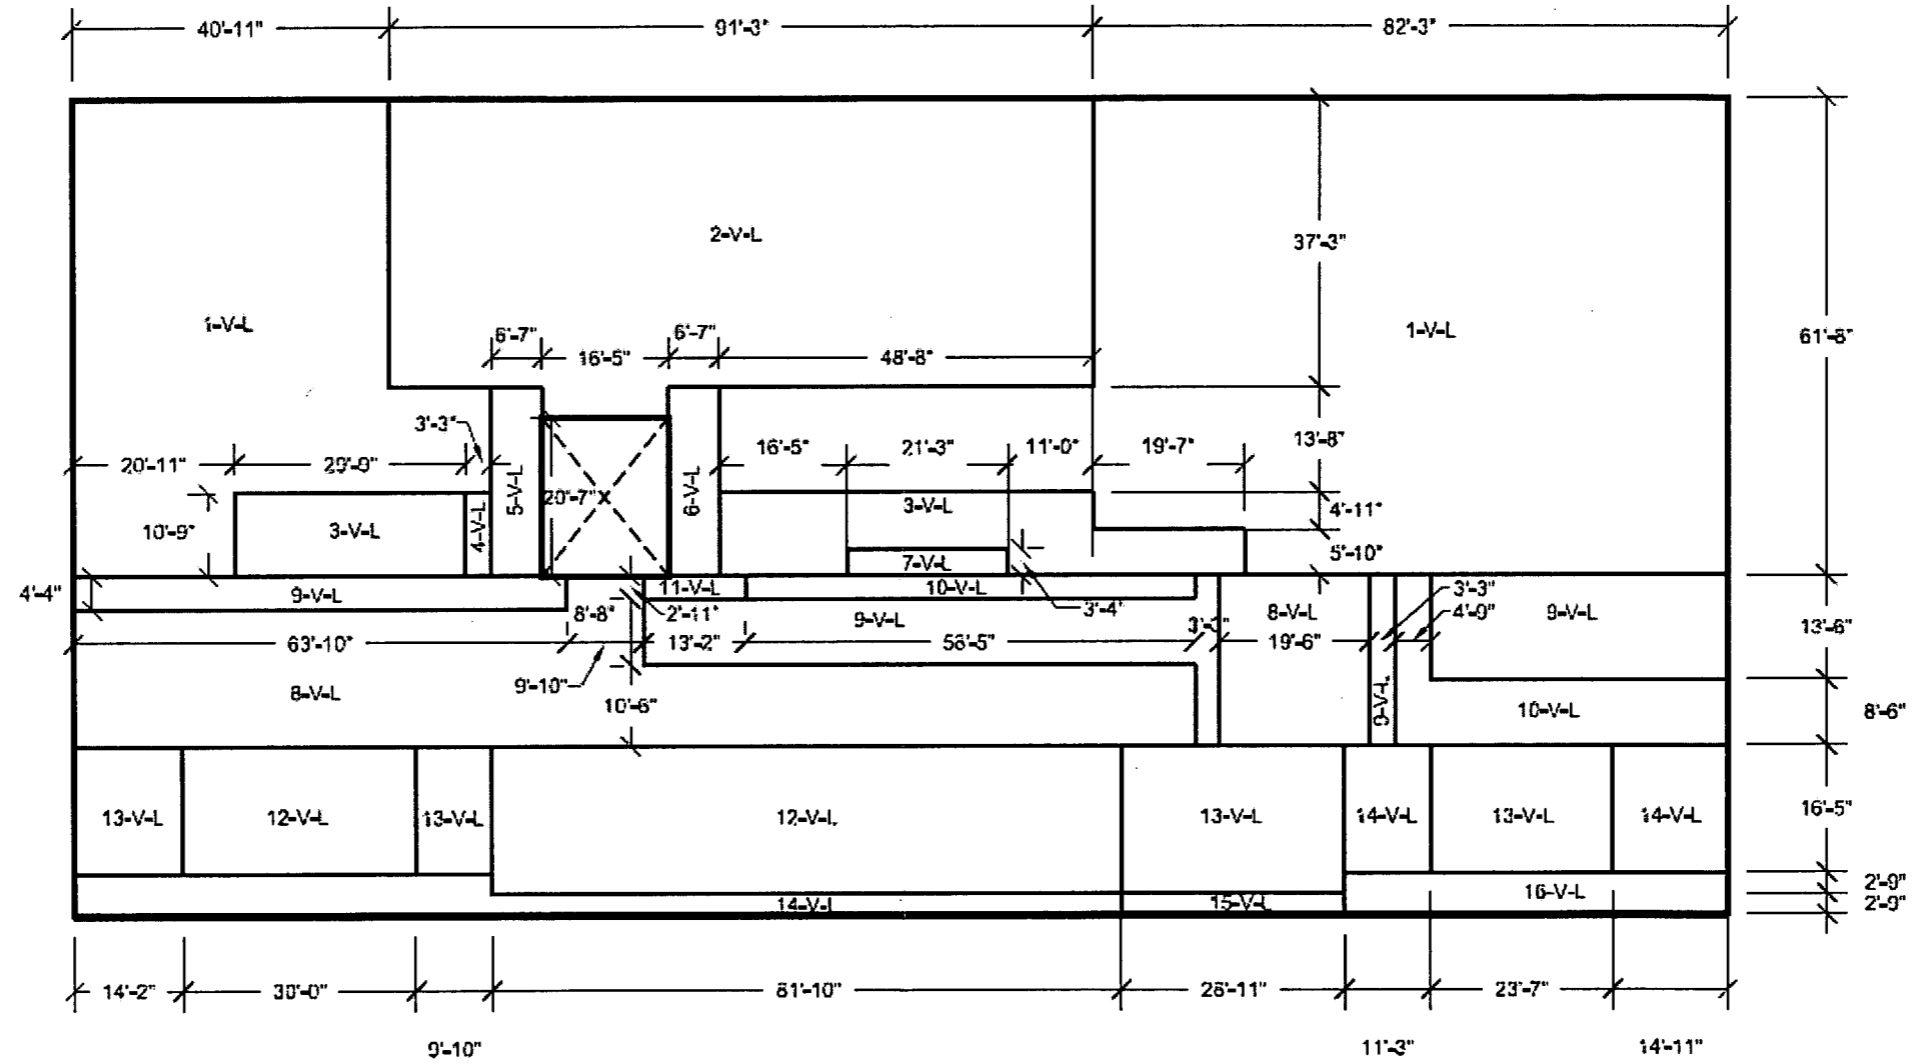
H.3-11: NORTH WALL LOOKING SOUTH
